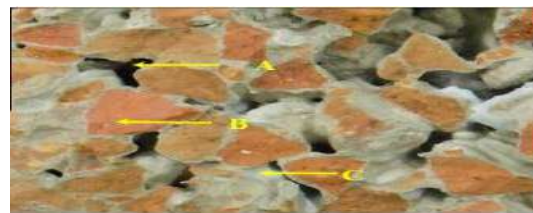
Fracture surface of PGC containing RB ; (A) open porosity ; (B) fractured RB ; (C) geopolymer paste [5]
